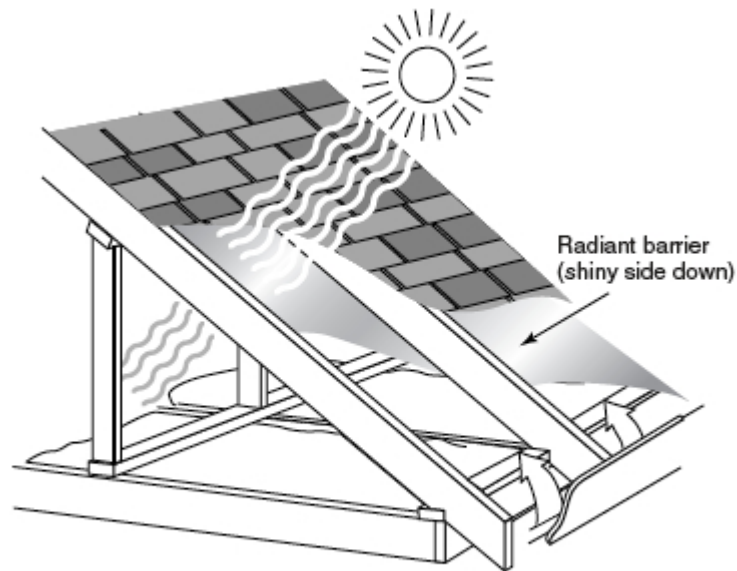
Diagram showing radiant barrier placement in a roof
